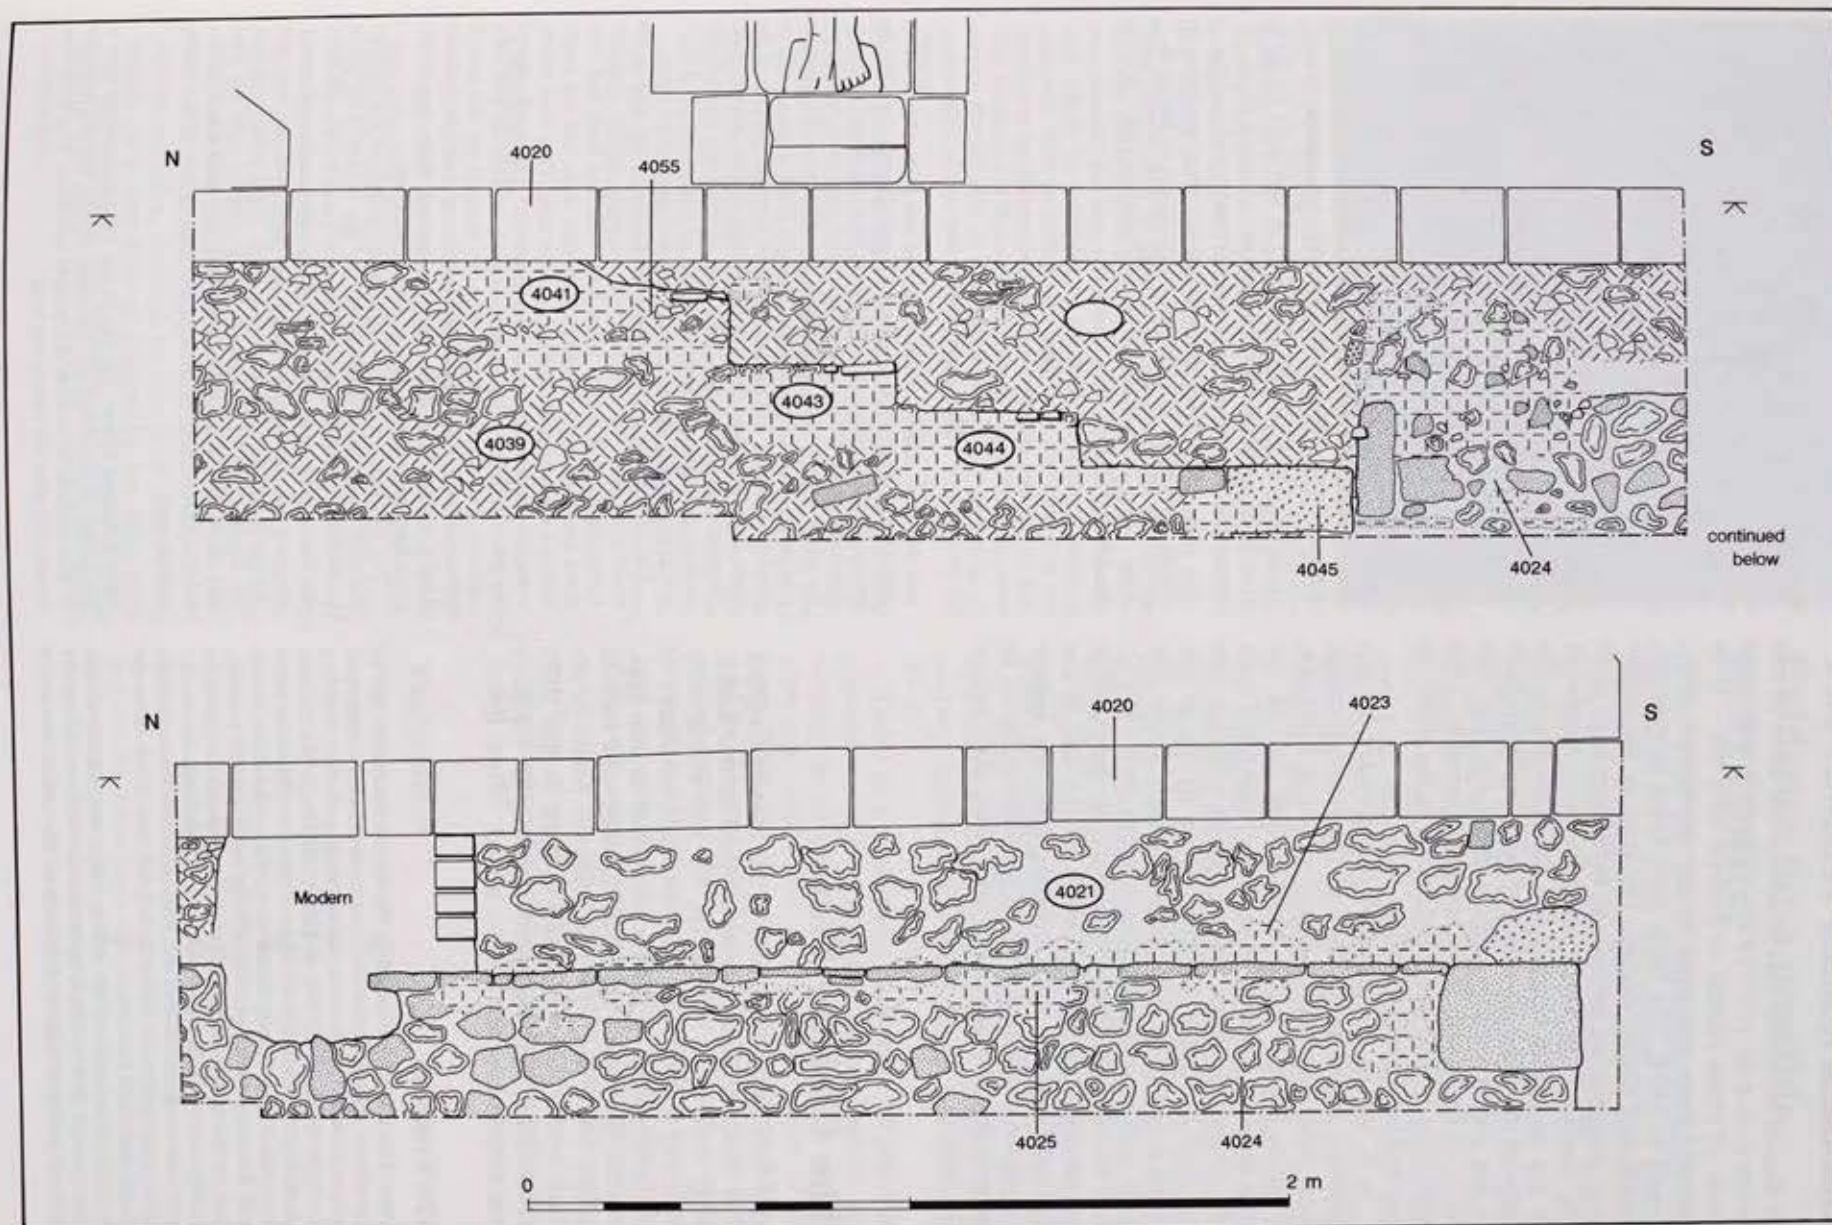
RA 1977: Elevation of footings of west wall of south transept. Step foundations and cloister bench. See Fig 36 for plan.
